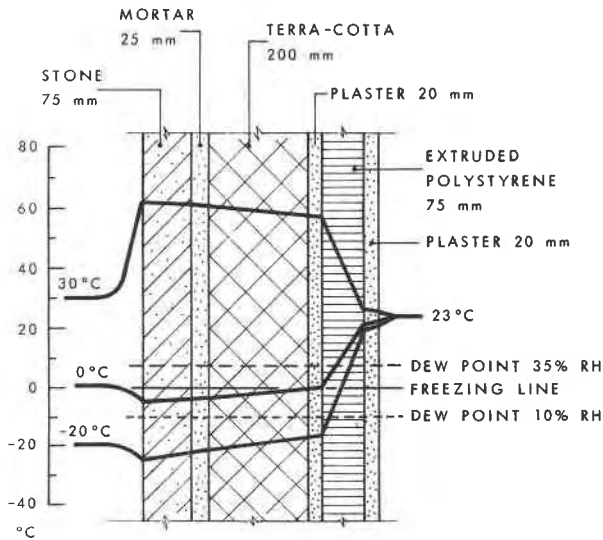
Thermal gradients, winter and summer conditions, for masonry wall insulated on inside.
